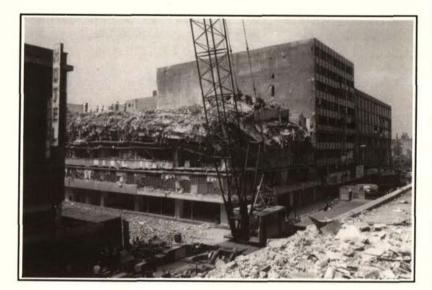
Pancake collapse of a manufacturing building in Mexico City because the columns did not match the requirement for ductile behaviour.
